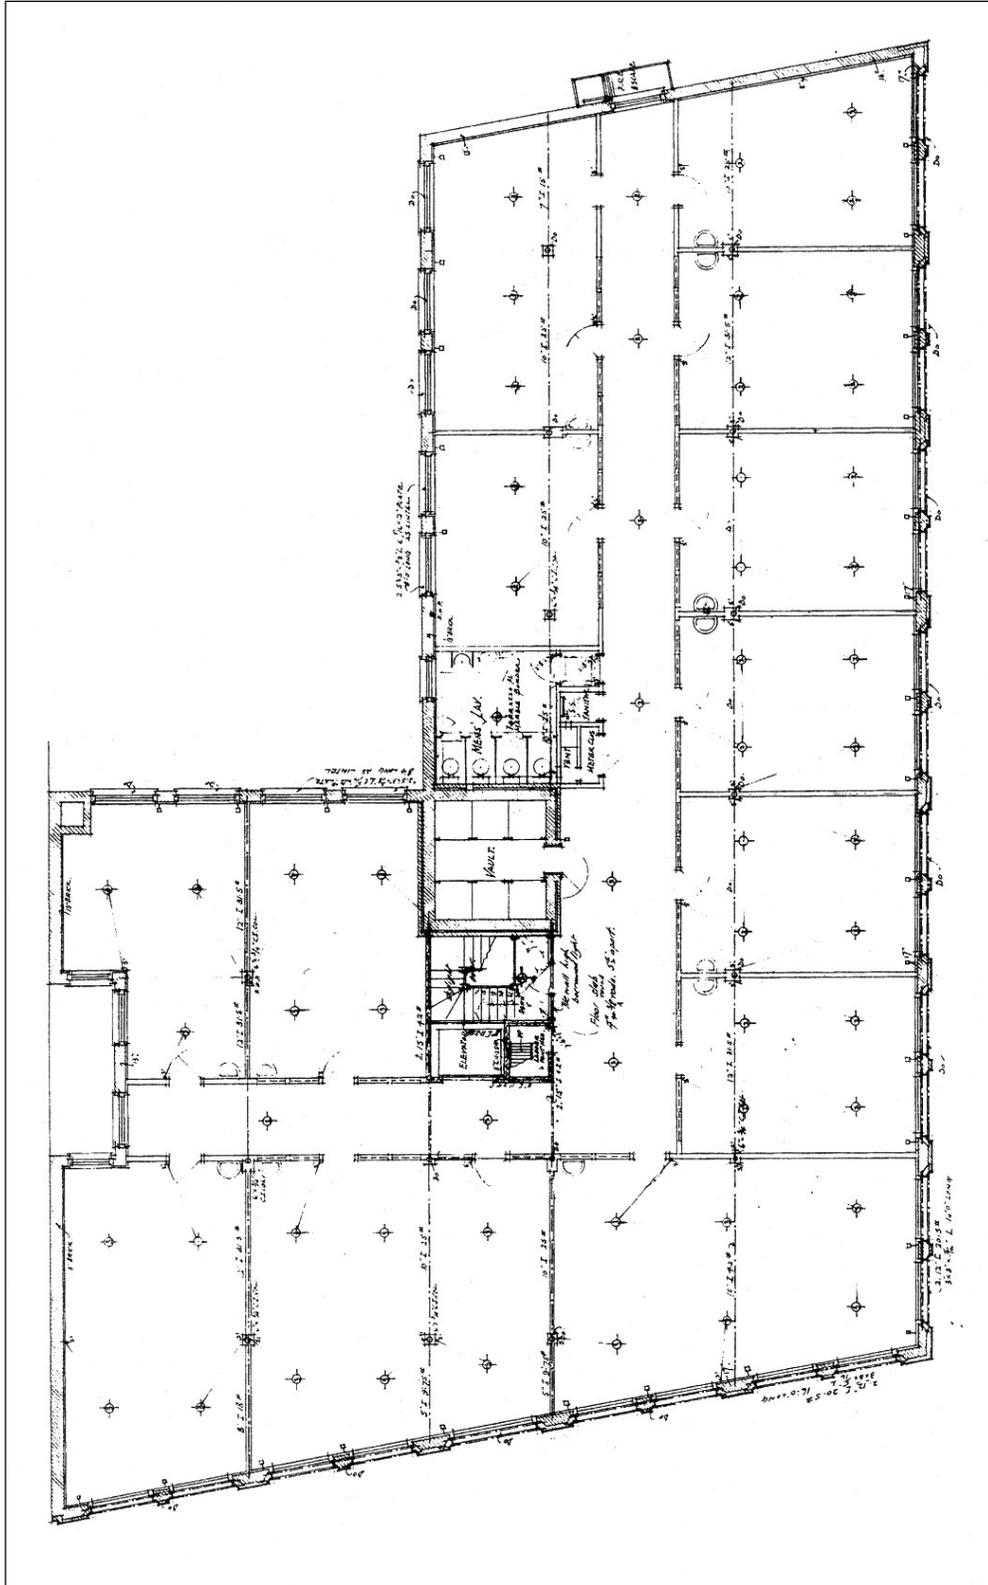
Architect’s plans, “Third Floor Plan,” 1912. (Courtesy of City Archives, Plan #1399/1912.)
